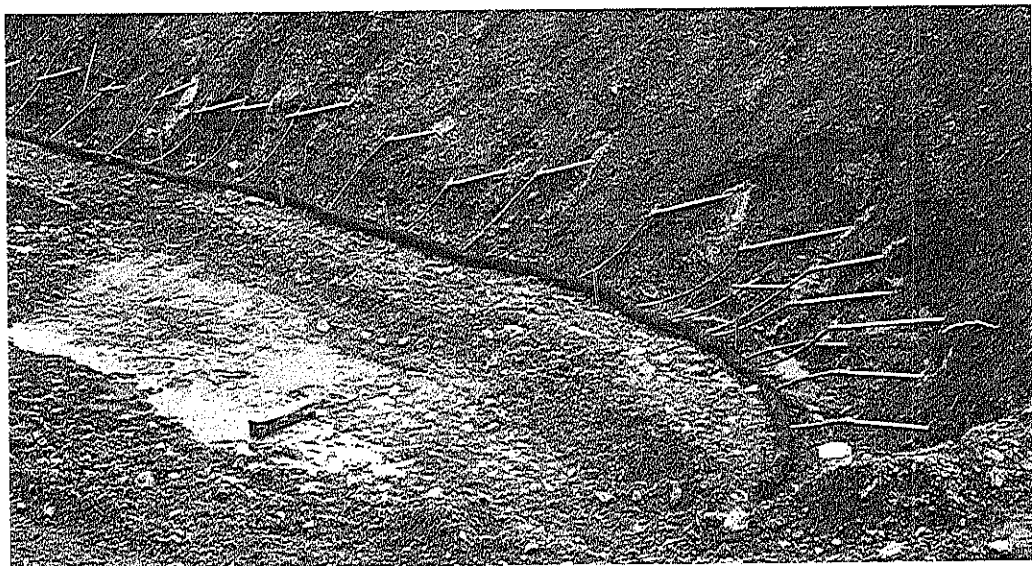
Horizontal drains connected to a corrugated plastic collector drain (Sandlake Road Slide, Oregon).
